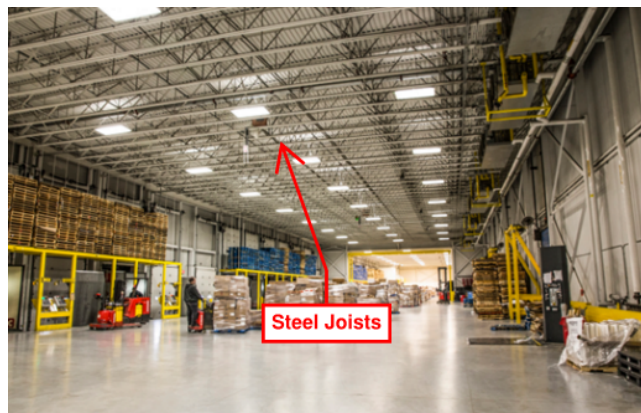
Steel Joist Used In a Warehouse Roof
